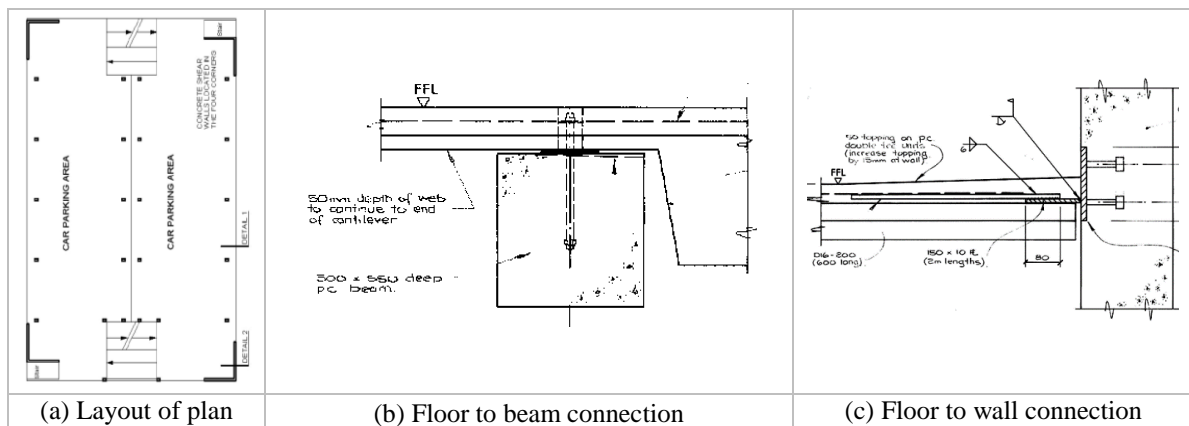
Layout of ANZAC car parking building, floor to slab, and floor to wall connections [3]
